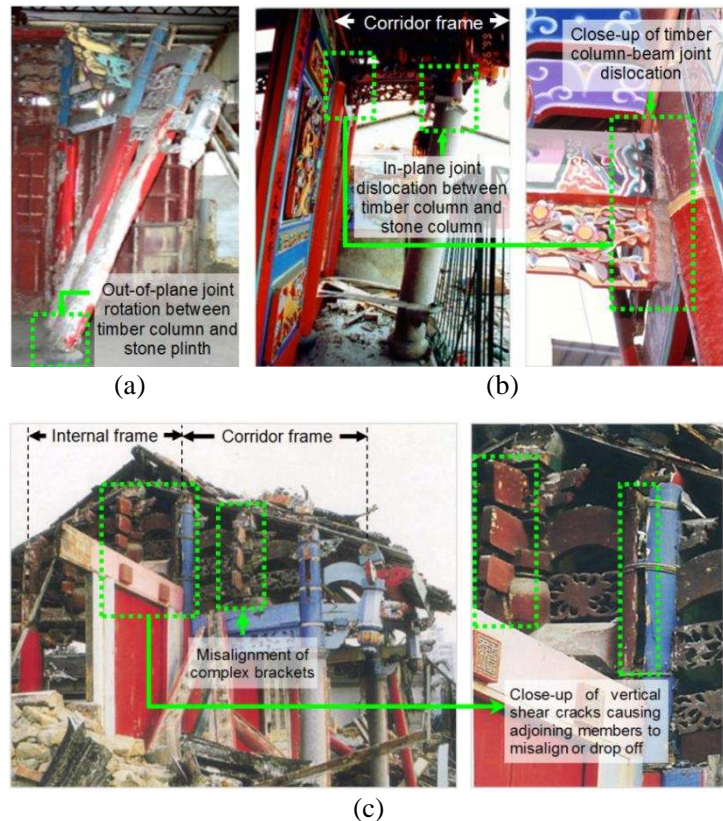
Typical damages observed in Dieh-Dou timber frame after the Chi-Chi earthquake: Joint dislocation occurring at (a) timber column base–stone column [7] and (b) timber column–beam region [6] and, (c) Shear crack causing misalignment of complex brackets [6]
